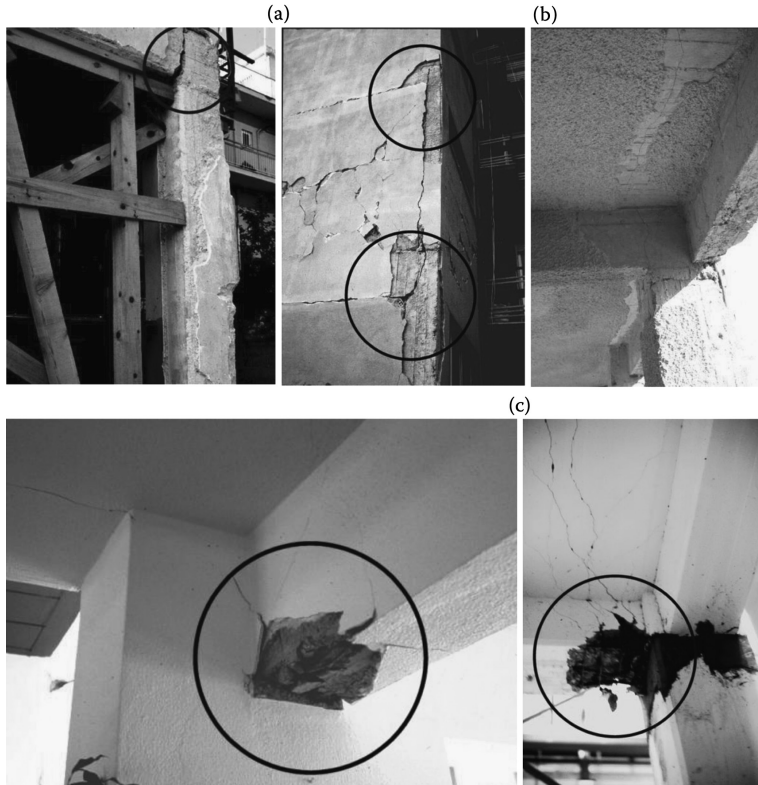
Typical features of beam behaviour: (a) pullout of beam bars from narrow corner column, due to short straight anchorage there; (b) wide crack in slab at right angles to the beam at the connection with the columns shows the large participation of the slab as effective flange width in tension; (c) failure, with concrete crushing and bar buckling at bottom flange next to the column.
